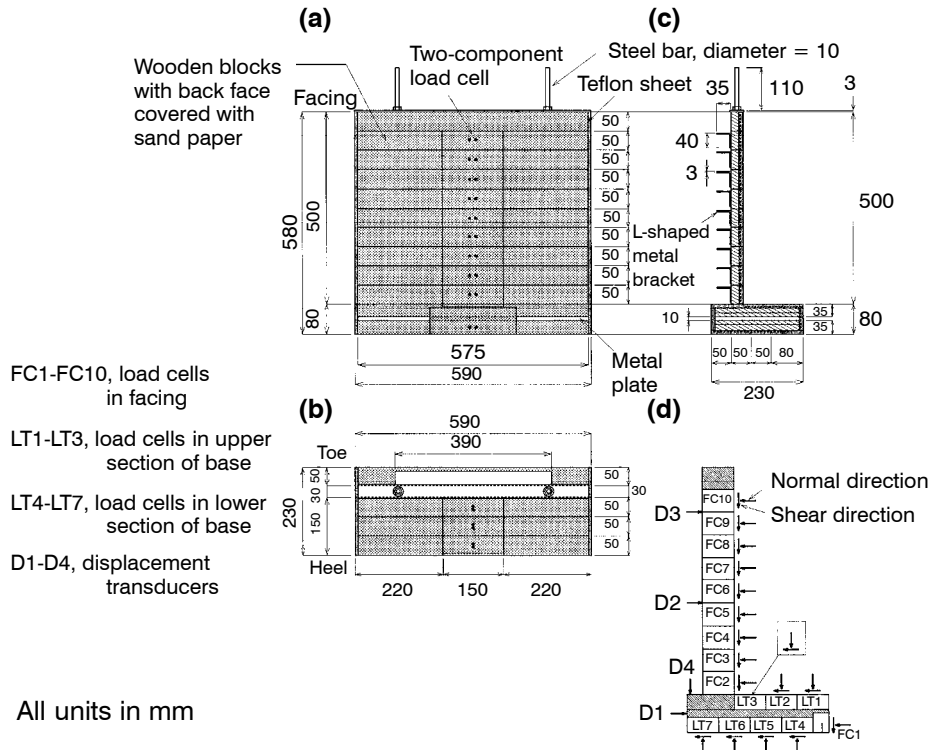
Structural details of the model cantilever-type retaining wall: (a) front view; (b) plan view; (c) side view; (d) load cells installed at the center line.
